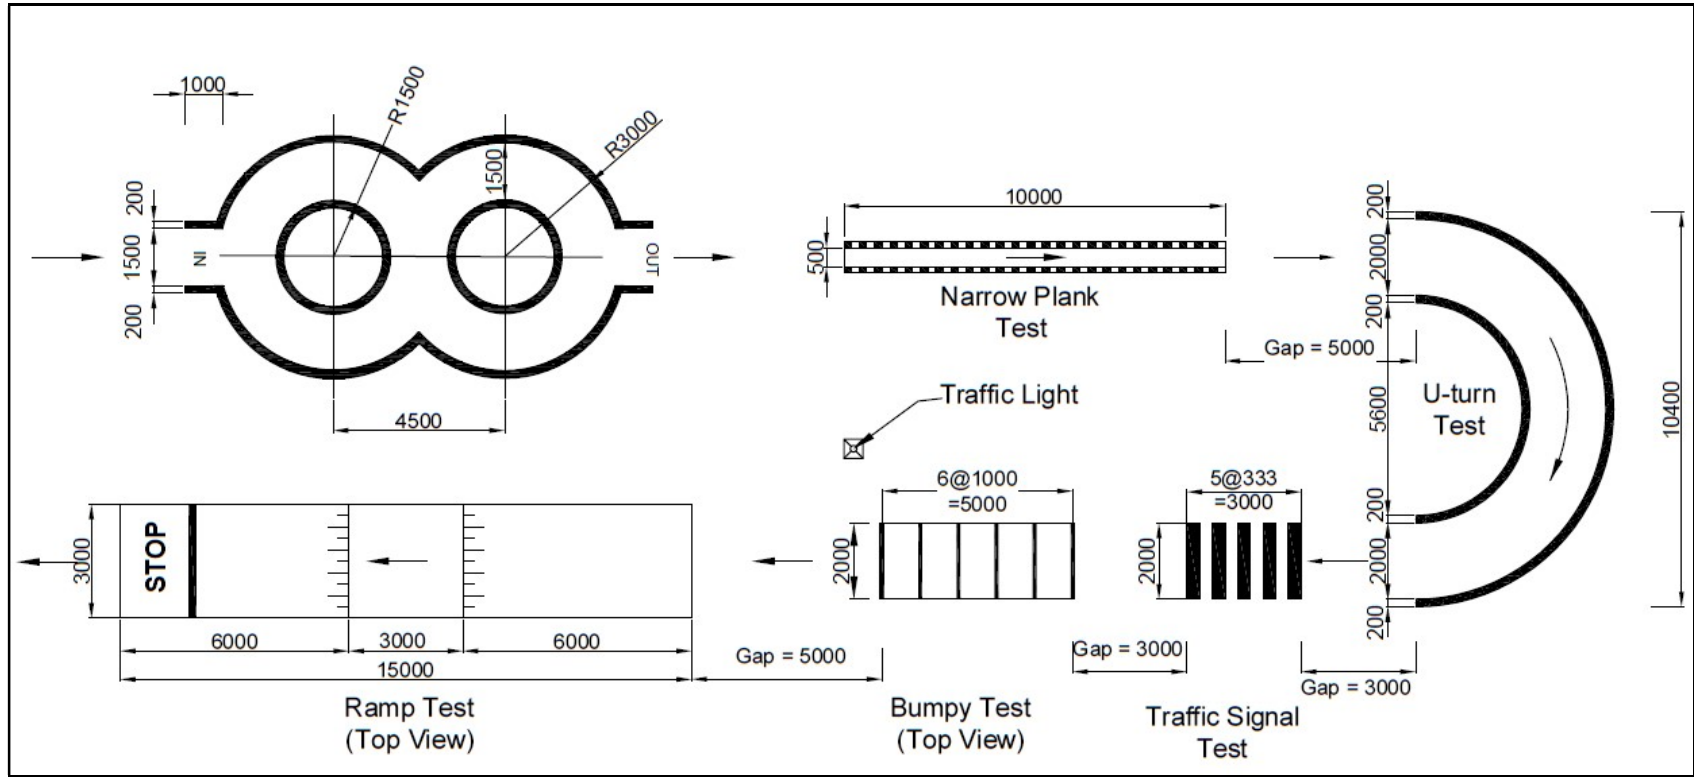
Overall Layout Plan for Trial Test (Two Wheeler)
